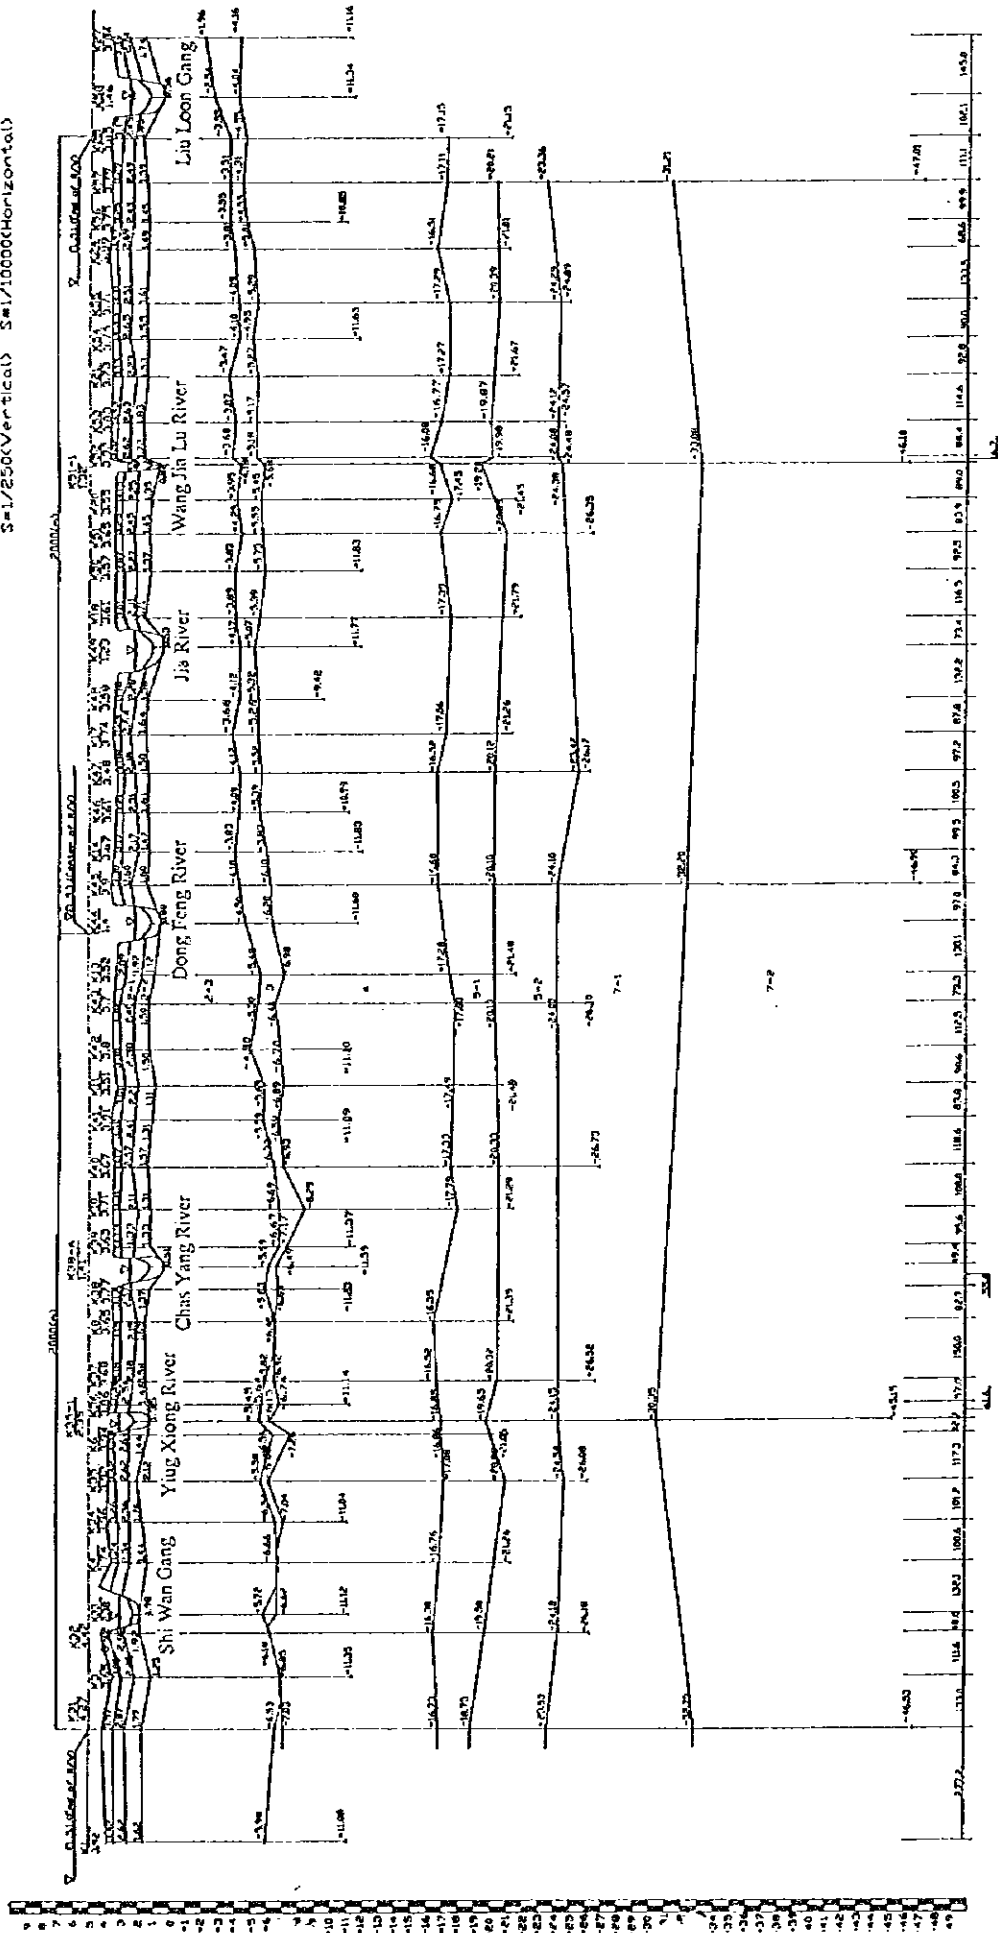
Longitudinal Geological Cross-Section of the Runway Area
